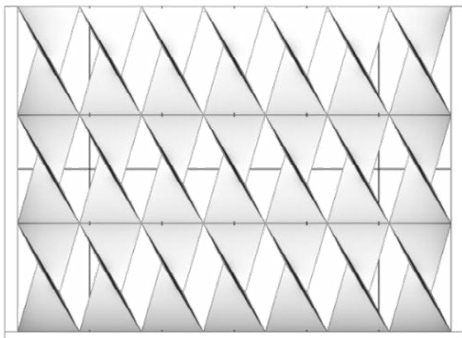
Elevation of full-scale façade generated from proposed dynamic module.
